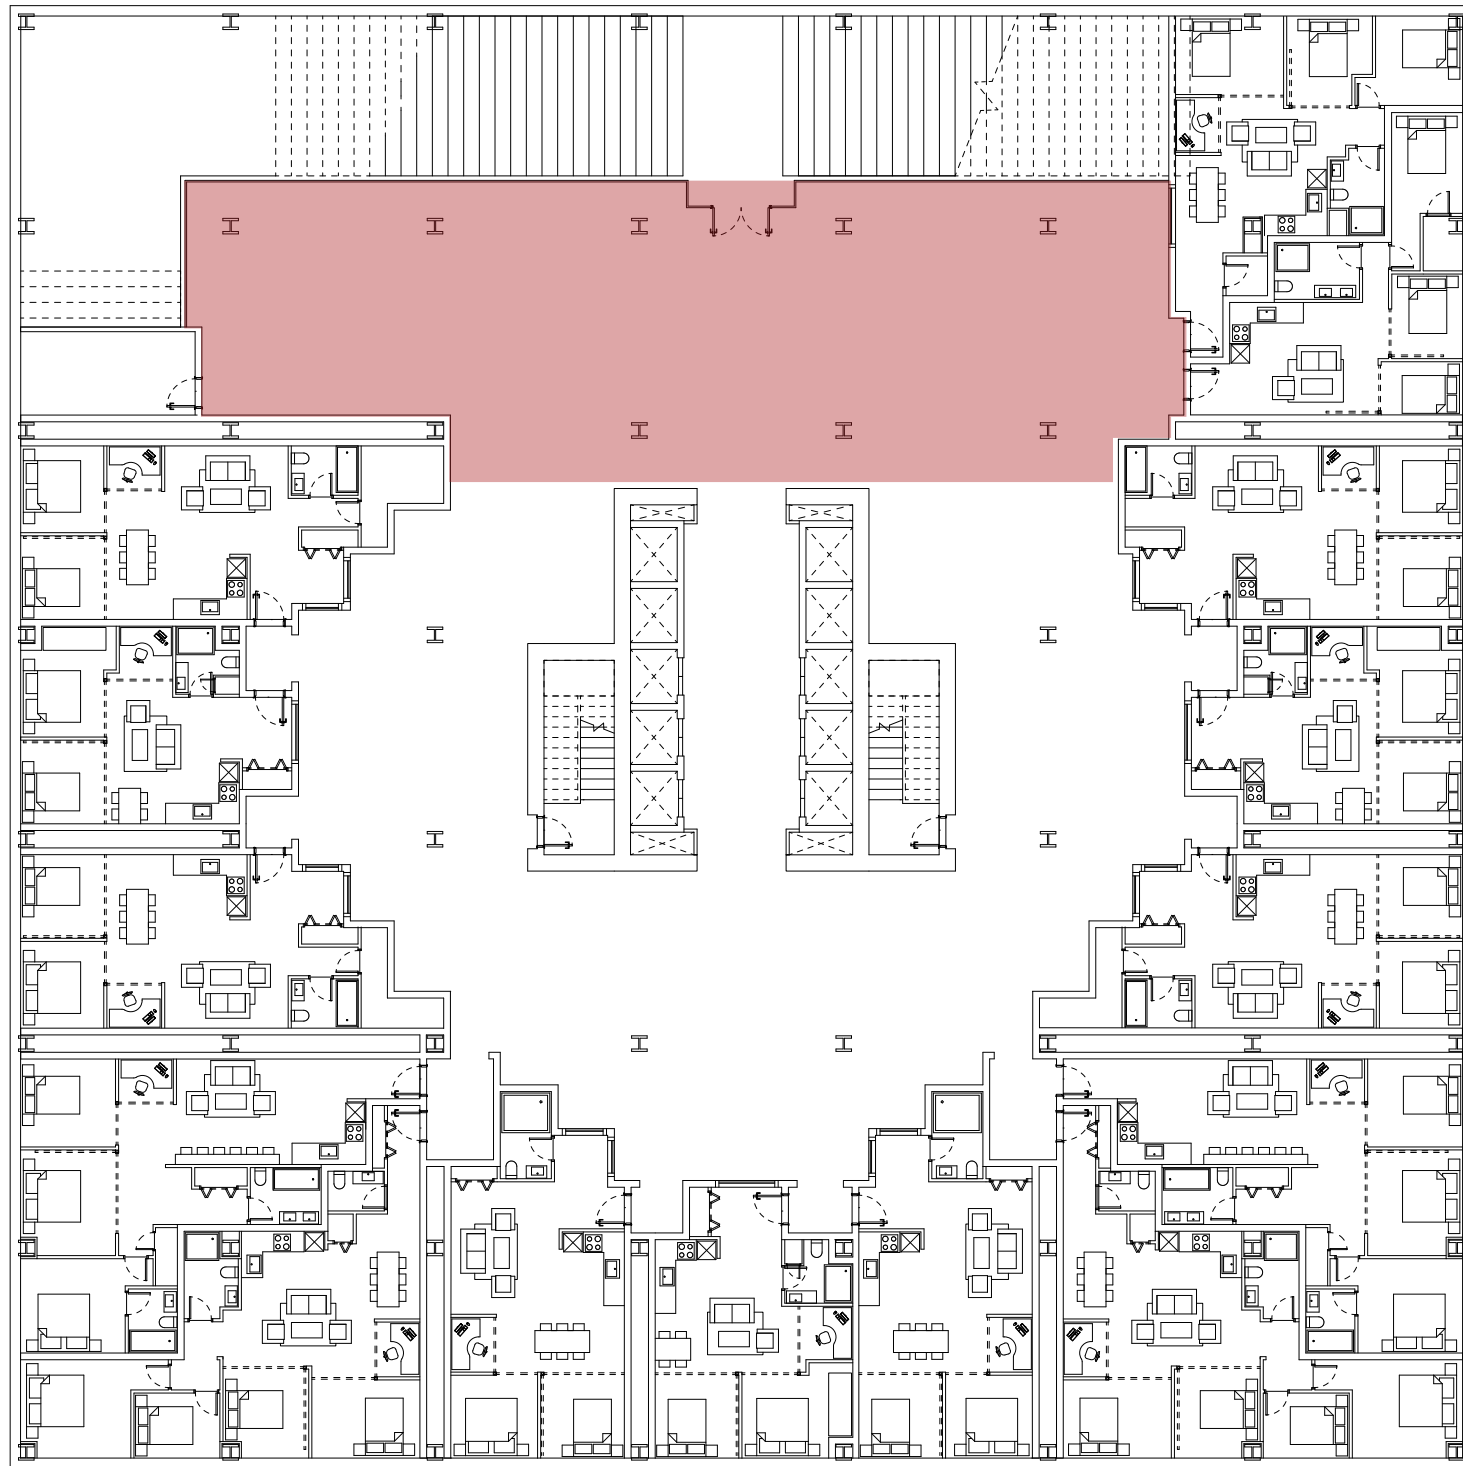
Rotated floor plans of a recurring residential floor with highlighted differing primary lounges.
